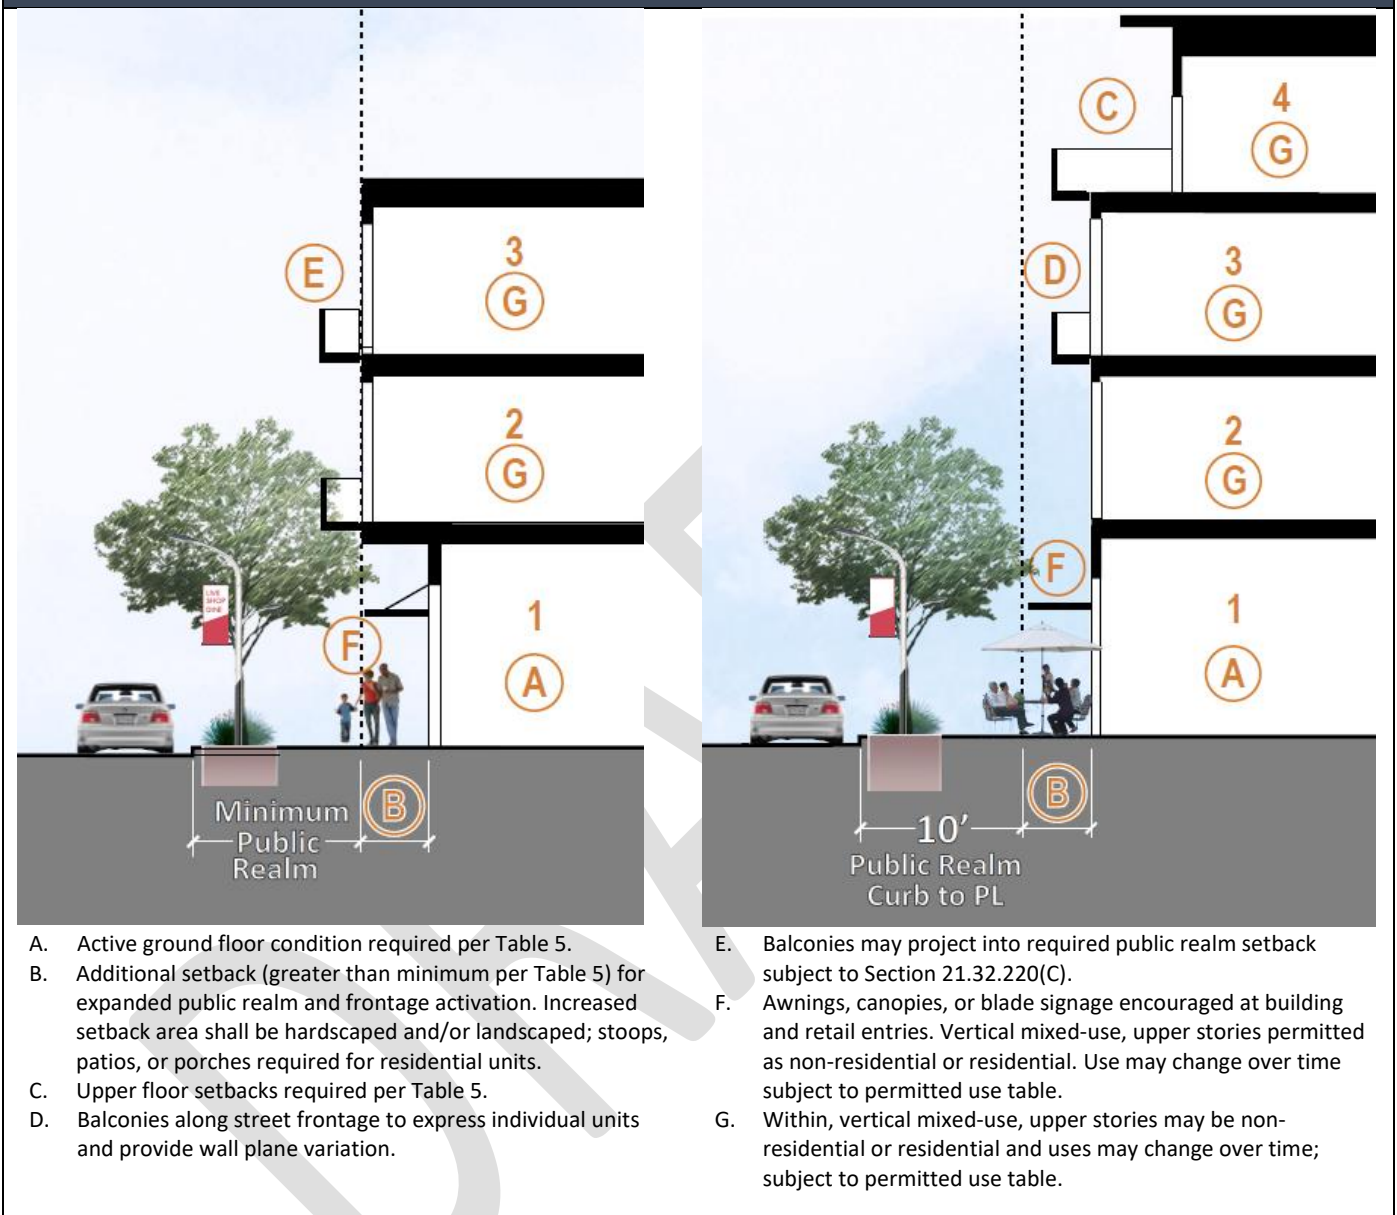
Building Placement & Activation Diagram – Mixed-Use Residential & Residential
